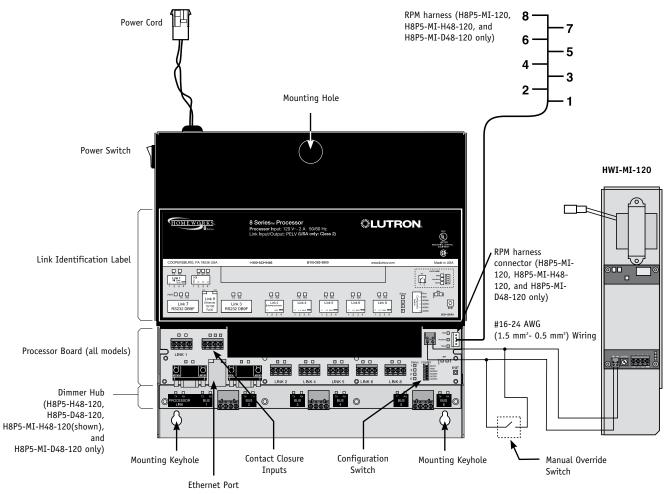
8 Series P5 Processor (H8P5-MI-H48-120 shown)
